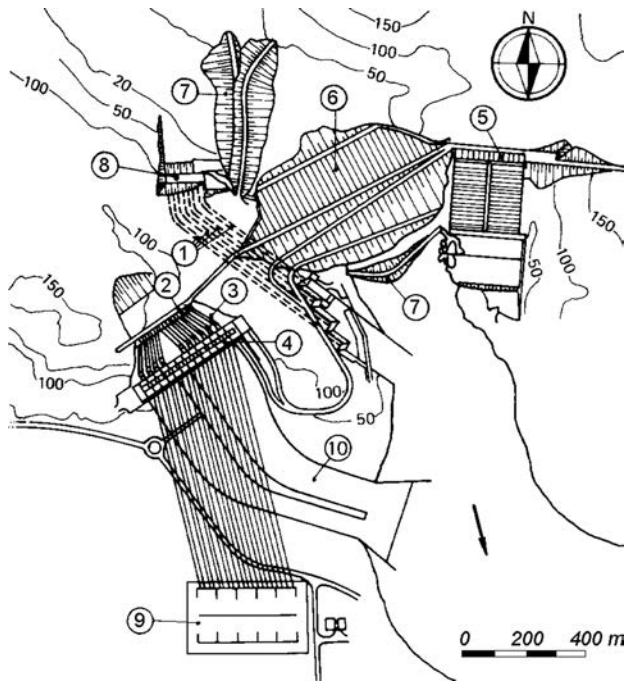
Layout plan of Xingo dam, with appurtenant structures. (1) Diversion tunnels; (2) intake for the hydroelectric power plant; (3) penstocks; (4) powerhouse; (5) spillway; (6) dam; (7) cofferdam; (8) intake for diversion of the river; (9) substation; (10) tailrace channel.
